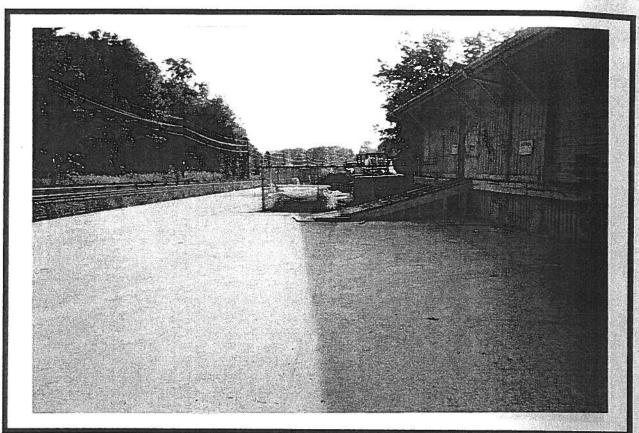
Concrete Pad/Road from New Roadway to Old Depot
